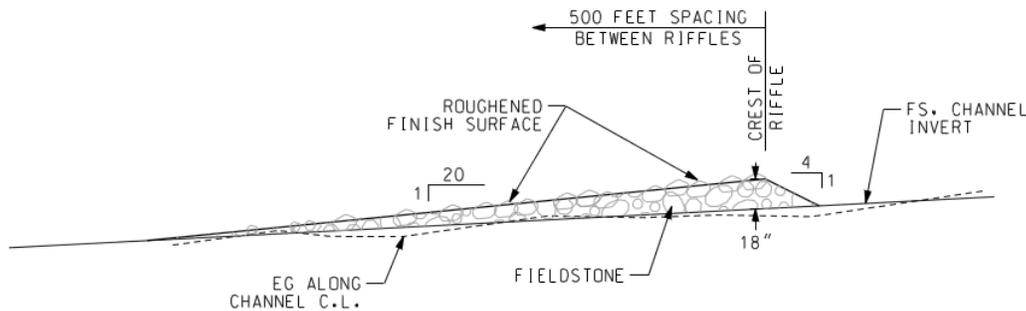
Typical Newbury Riffle Structure (Profile View)
